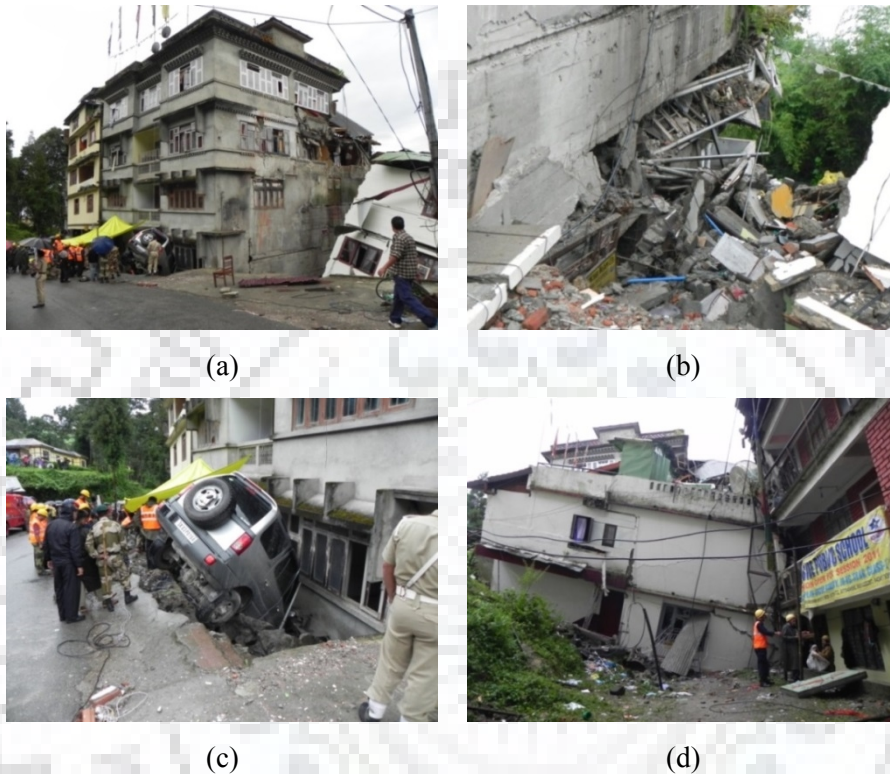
Collapse of a split-foundation (SF) building observed after the 2011 Sikkim earthquake. The collapse of this split-foundation building has also caused collapse of an adjacent building.
